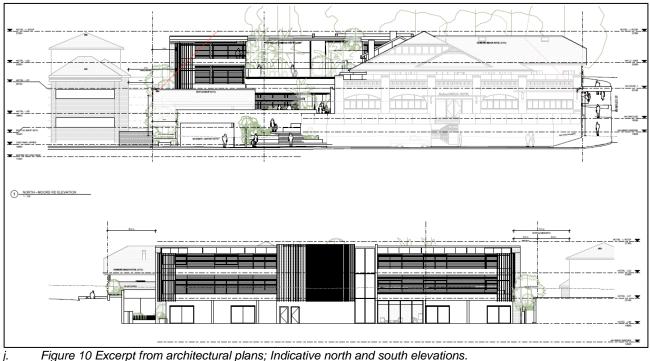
Excerpt from architectural plans; Indicative north and south elevations.
